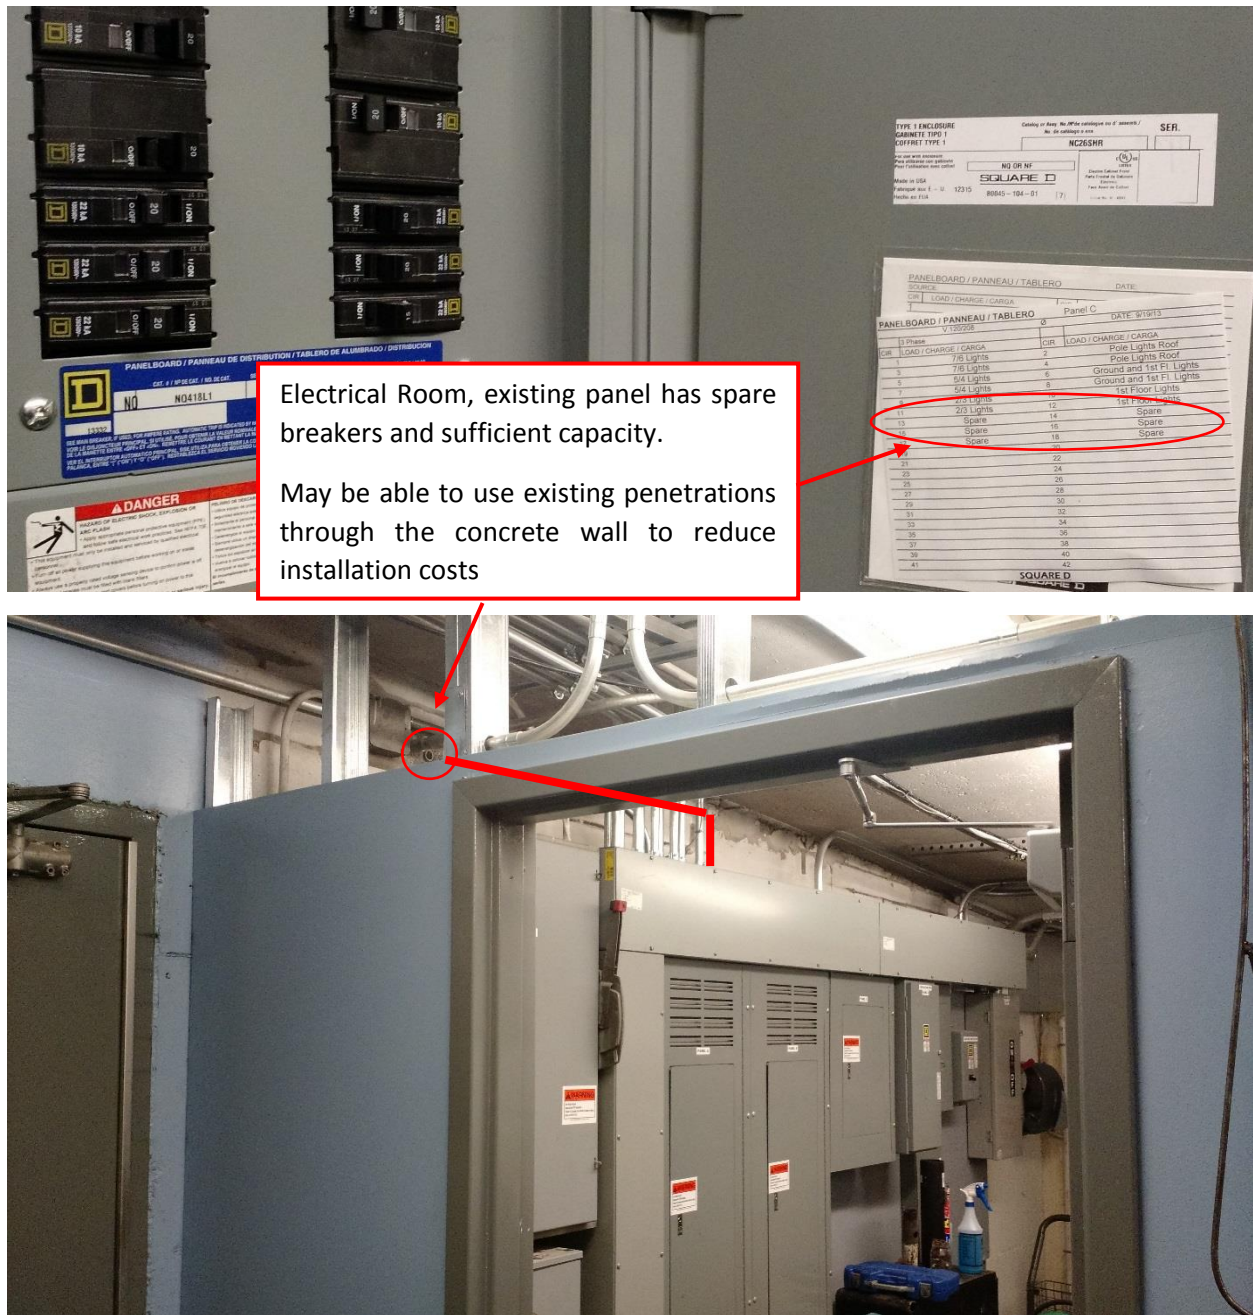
Electrical room and panel for the proposed location for a new charging station at Seneca Street Garage
